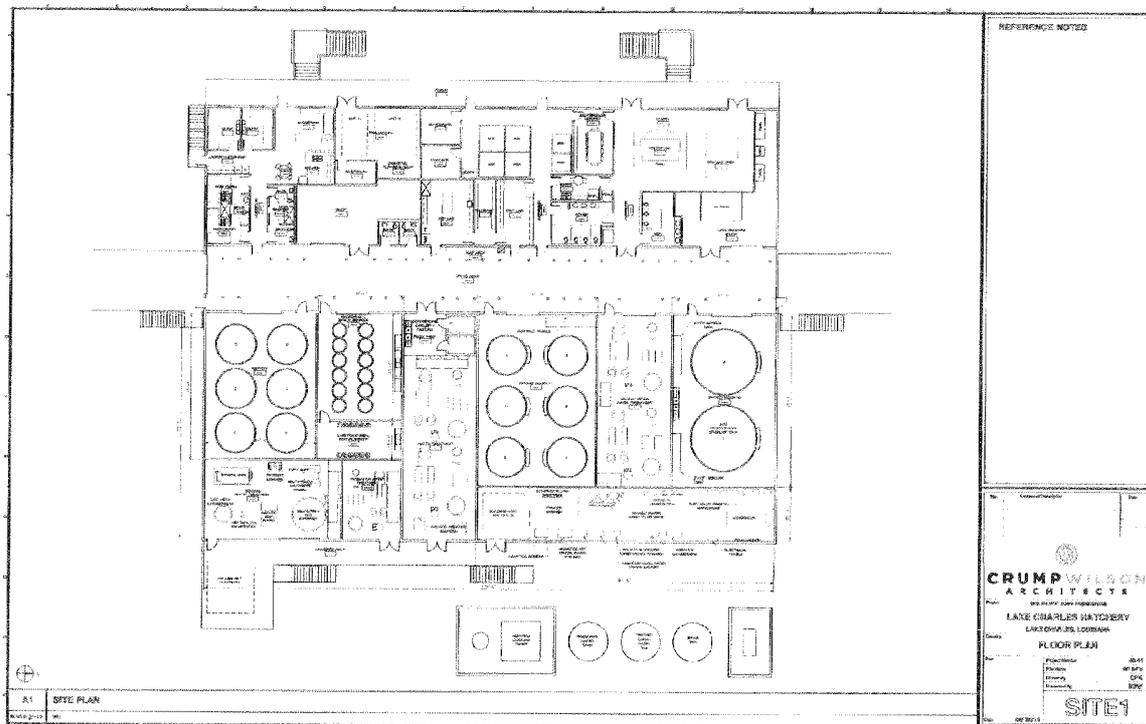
Proposed floor plan for Calcasieu Parish multi-purpose building.
